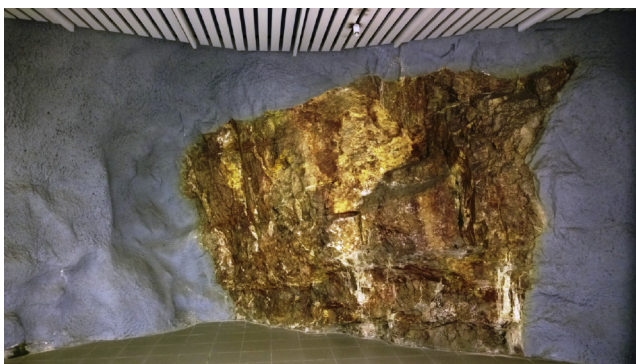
A bare uncovered rock surface 'window' in the Kluuvi underground parking hall in Helsinki (Photo: Ilkka Vähäaho).
